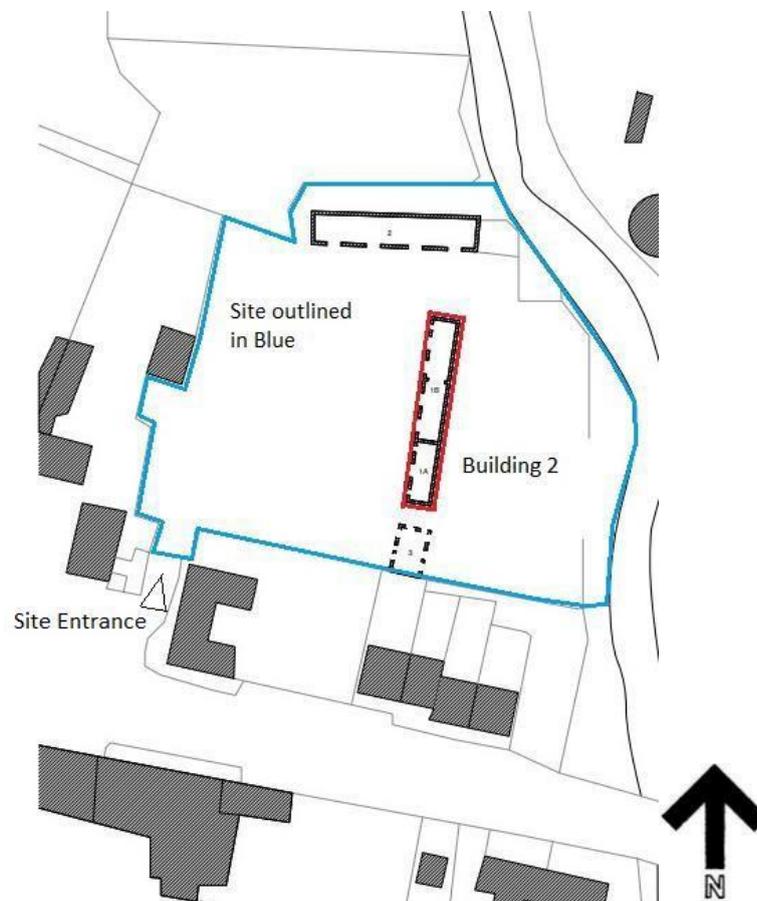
Site plan of the Tanyard, prepared by Kildare County Council. Building No. 2, a detached stone rubble former tannery, is located on the east side of the site.
